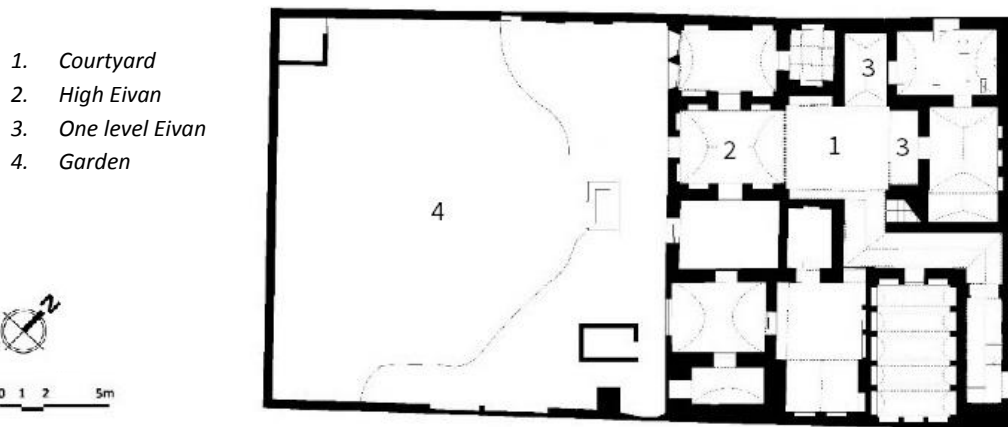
, Karimi house ground floor plan, source: (YCHHTO 2013)
